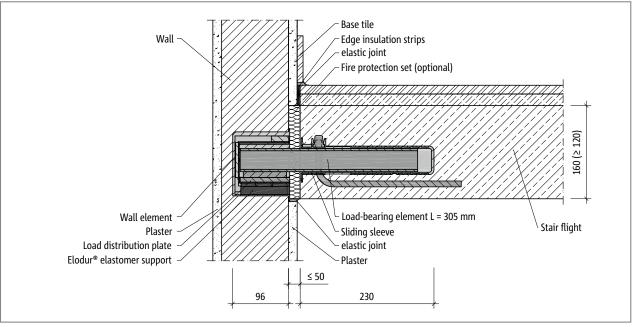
Schöck Tronsole® type Q-FV or Q-A2: Installation cross-section wall thickness 11.5 cm
